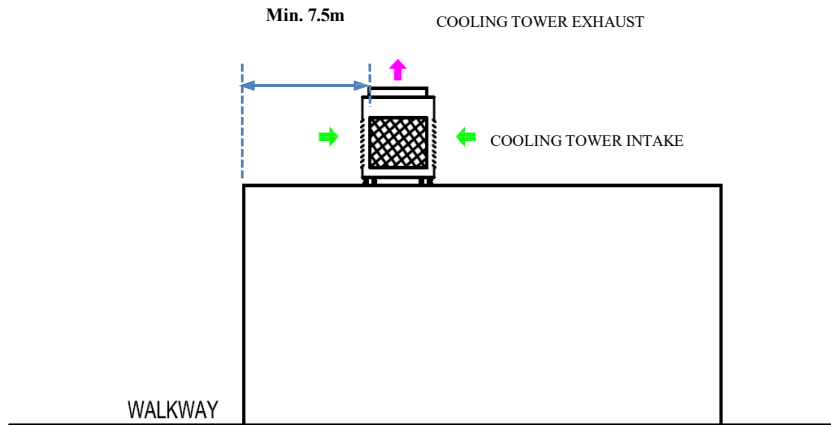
Cooling tower on roof with minimum 7.5m horizontal separation from surrounding air intakes and exhausts, operable windows and public access.
